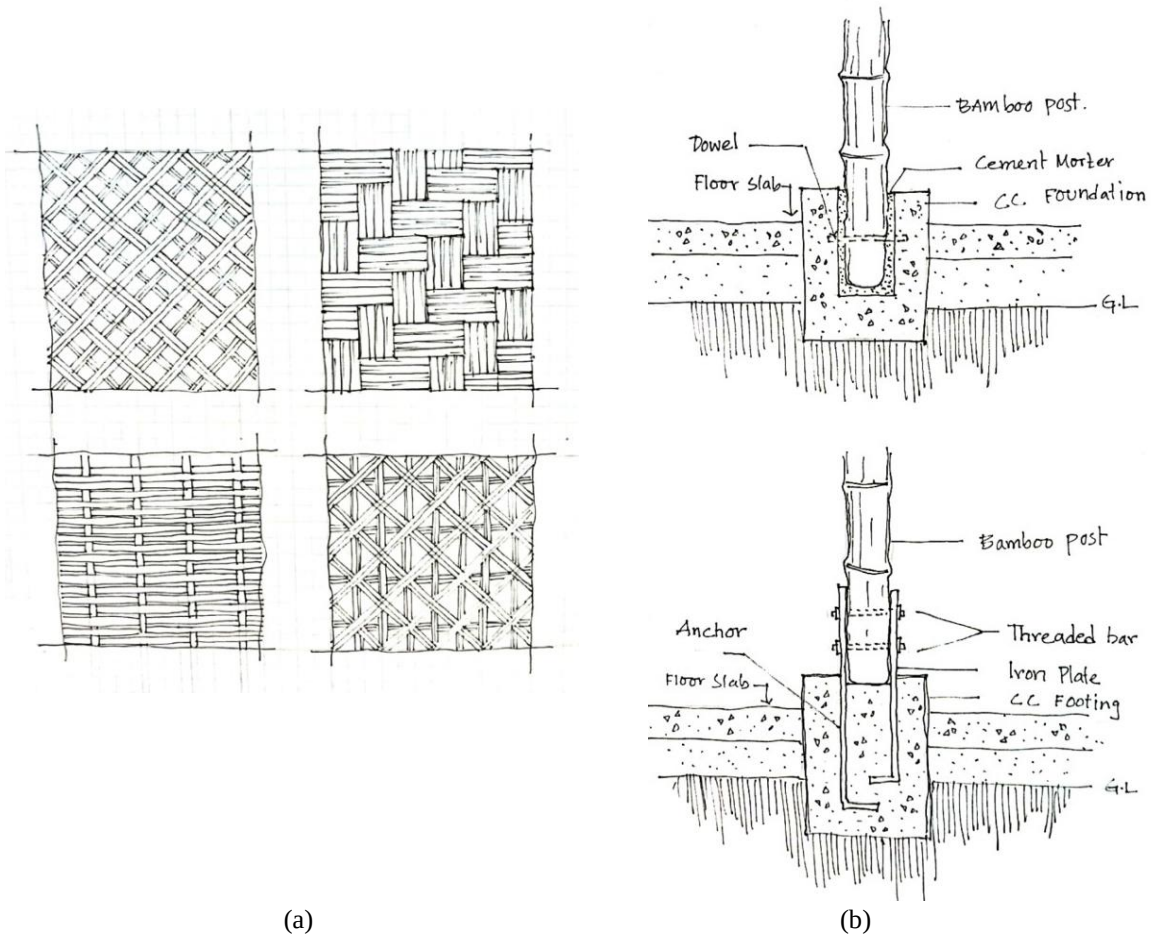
Use of Bamboo mat and detail of fixing bamboo post. (a) Showing different bamboo woven mat used as wall of CFSs. Source: Field survey by Author, 2021. (b) Showing details of fixing bamboo post into concrete floor slab used in selected CFSs in Cox's Bazar. Source: Hunnarshala foundation for building technology and innovations, 2013. Sketch: Author, 2021
